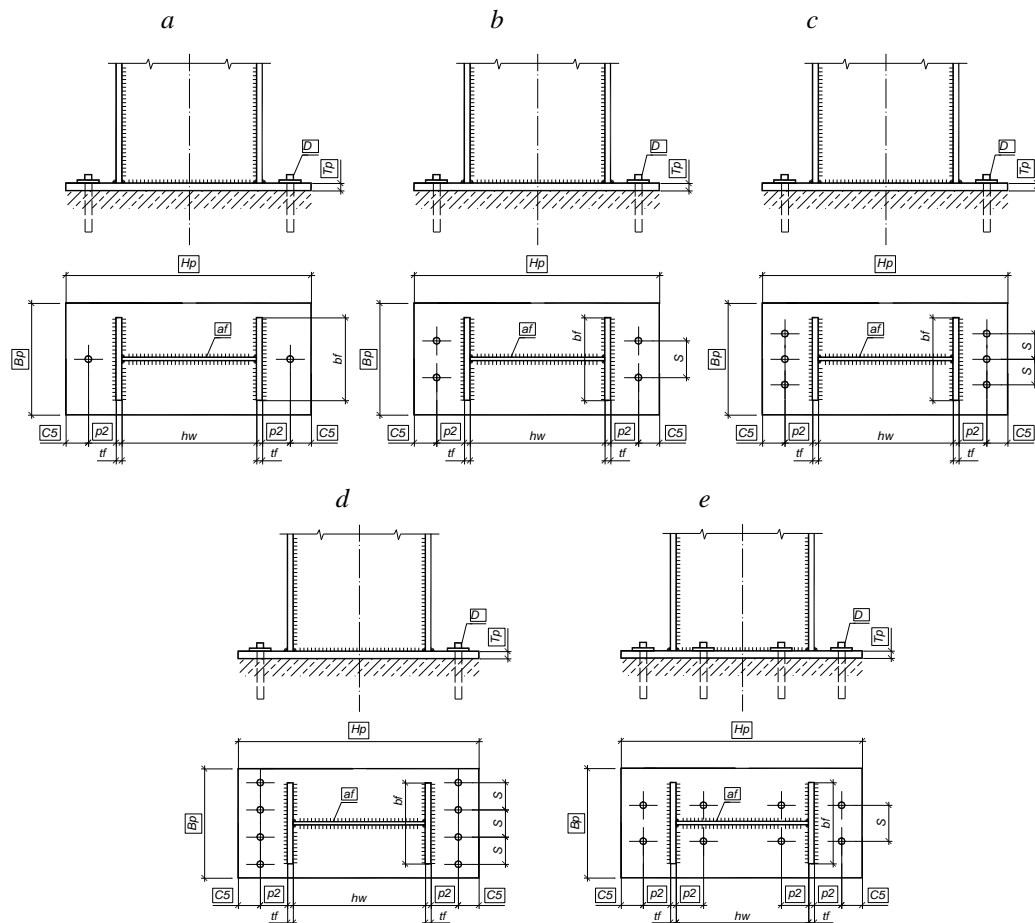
Types of designs for the joint of rigid column bases without wing plates and cantilever stiffeners
